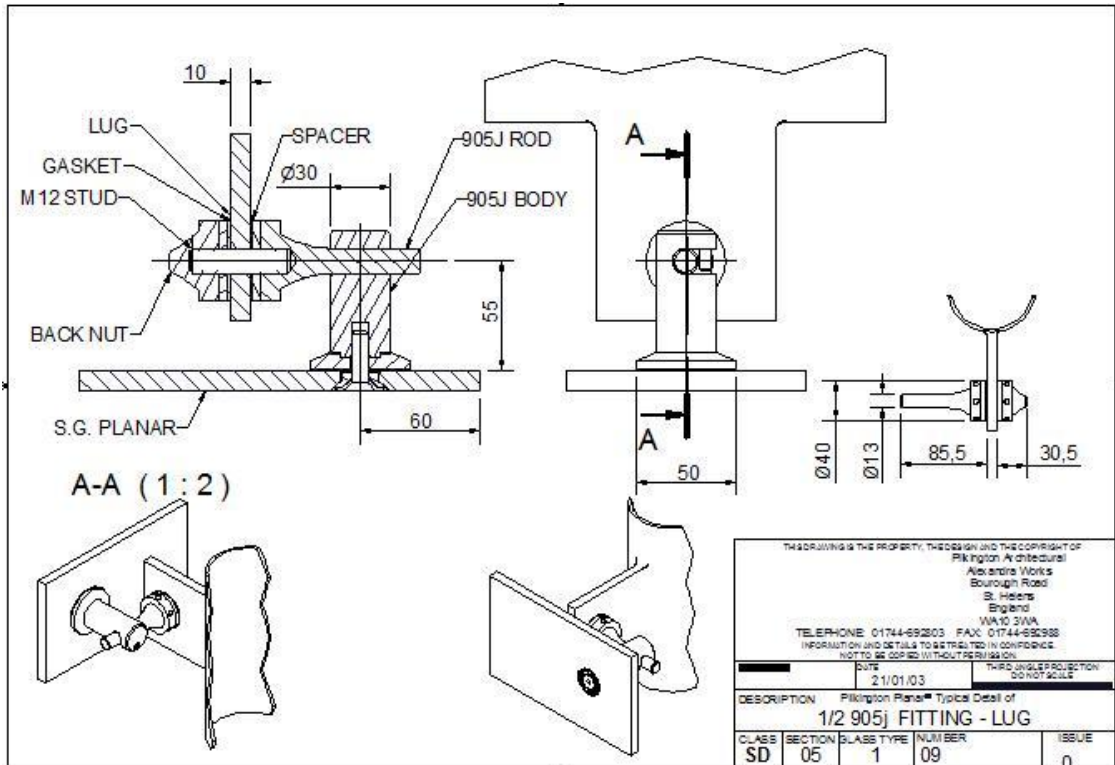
1-Point Connector to Glass for Curtain Wall Detail (Pilkington, 2009)
